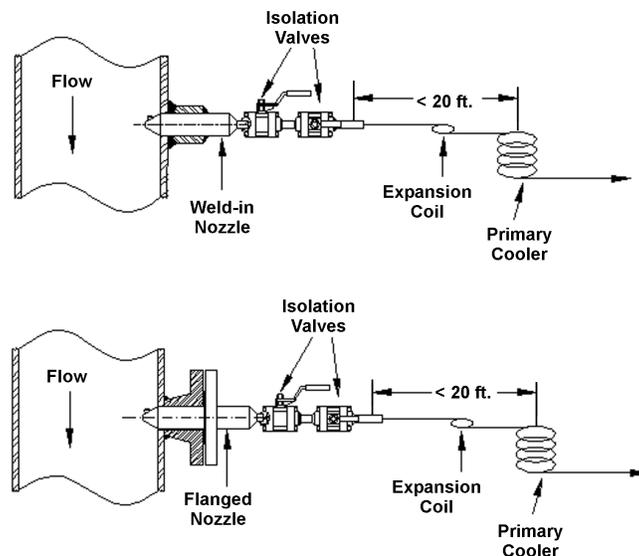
Installation of weld-in Nozzle (top) and flanged Nozzle (bottom)
